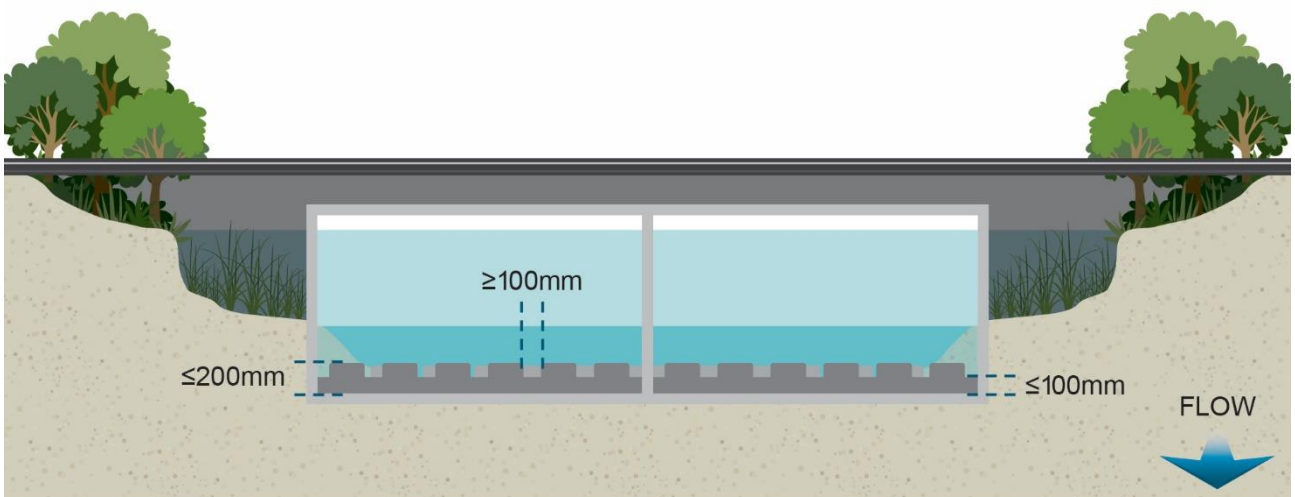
Interim floor baffles on existing culvert crossing (cross-section of waterway) – tidal (grey), purple, red, amber and green waterways
